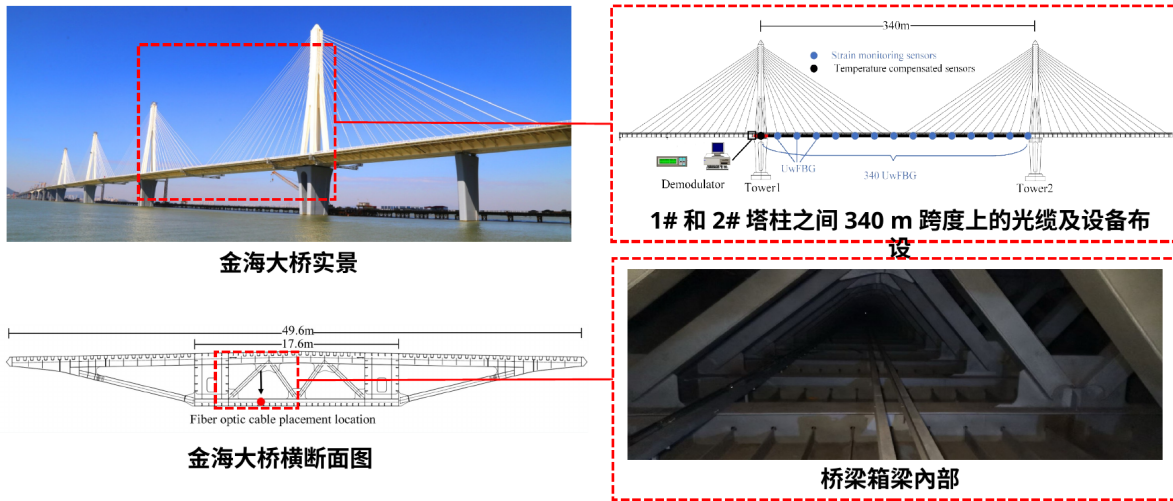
Target monitoring area: the 340 m span between Tower 1 and Tower 2, including cross-section and cable placement region inside the box girder.
